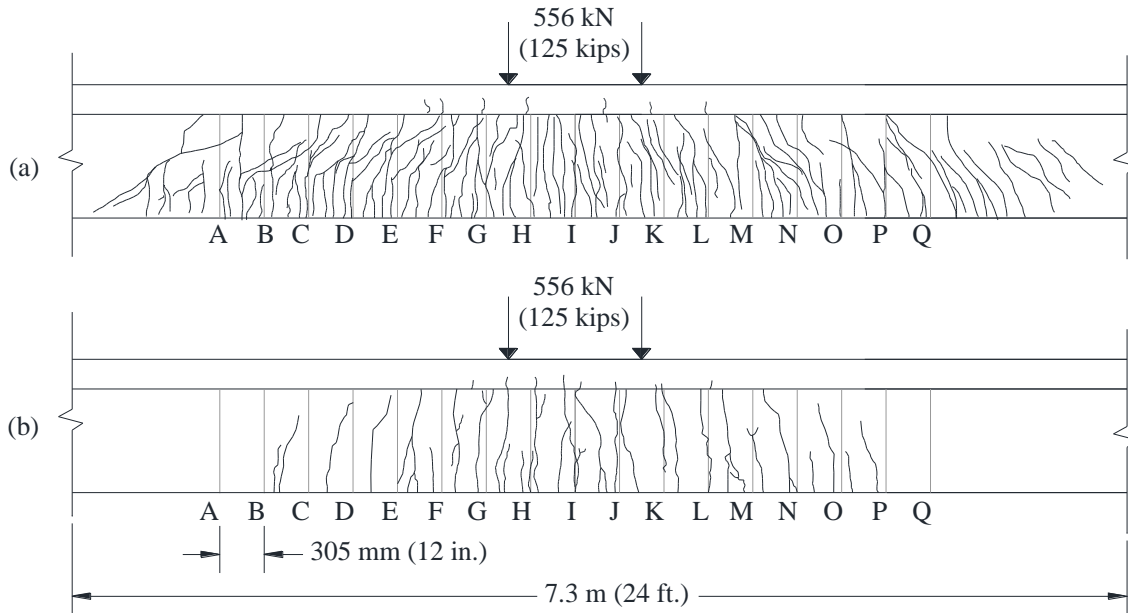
Comparative Crack Pattern under Flexure Test: (a) AFRP Specimen and (b) Control Specimen.
